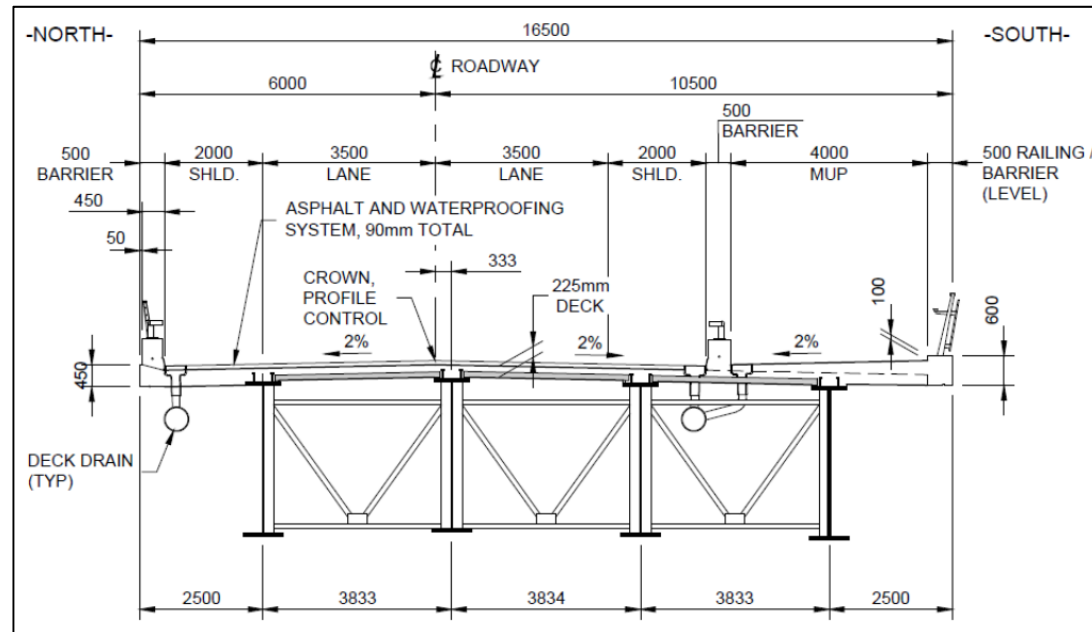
Cross-Section with Partial Precast Panels
